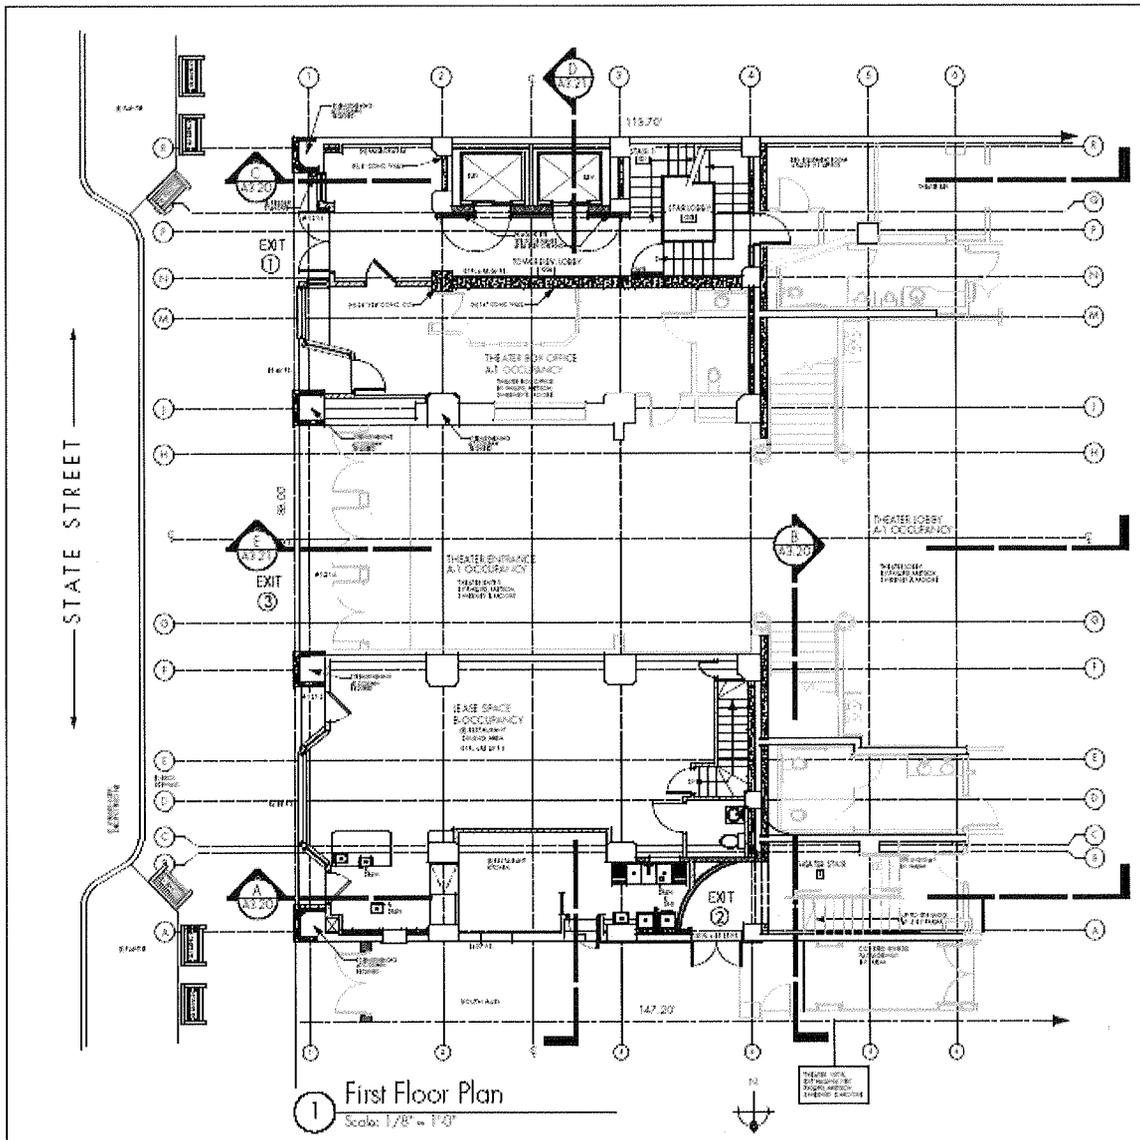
First Floor Plan of Building, Showing Relative Location of State Street Passenger Drop-Off Pocket
